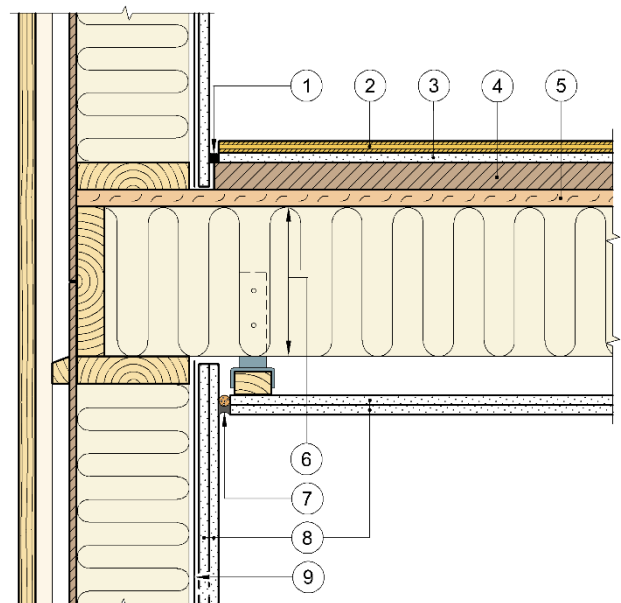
shows construction detail for connection between timber floor construction and external timber wall.
